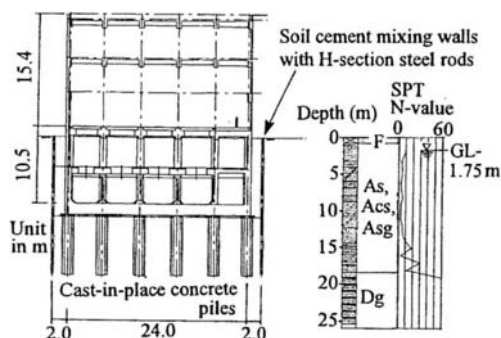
Typical cross section of Shimagami pumping station and bore hole survey results
